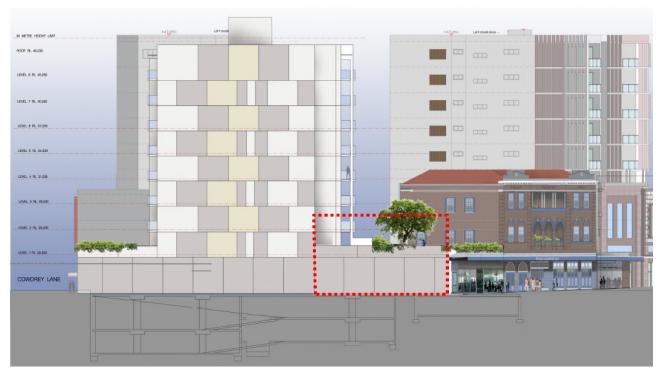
REVISED DA Streetscape view from southern side of Everton Road showing façade of The Hotel Core's façade and parapet. Western side now steps down towards boundary, base of residential building treated with brickwork as a visual key with Hotel Core.
